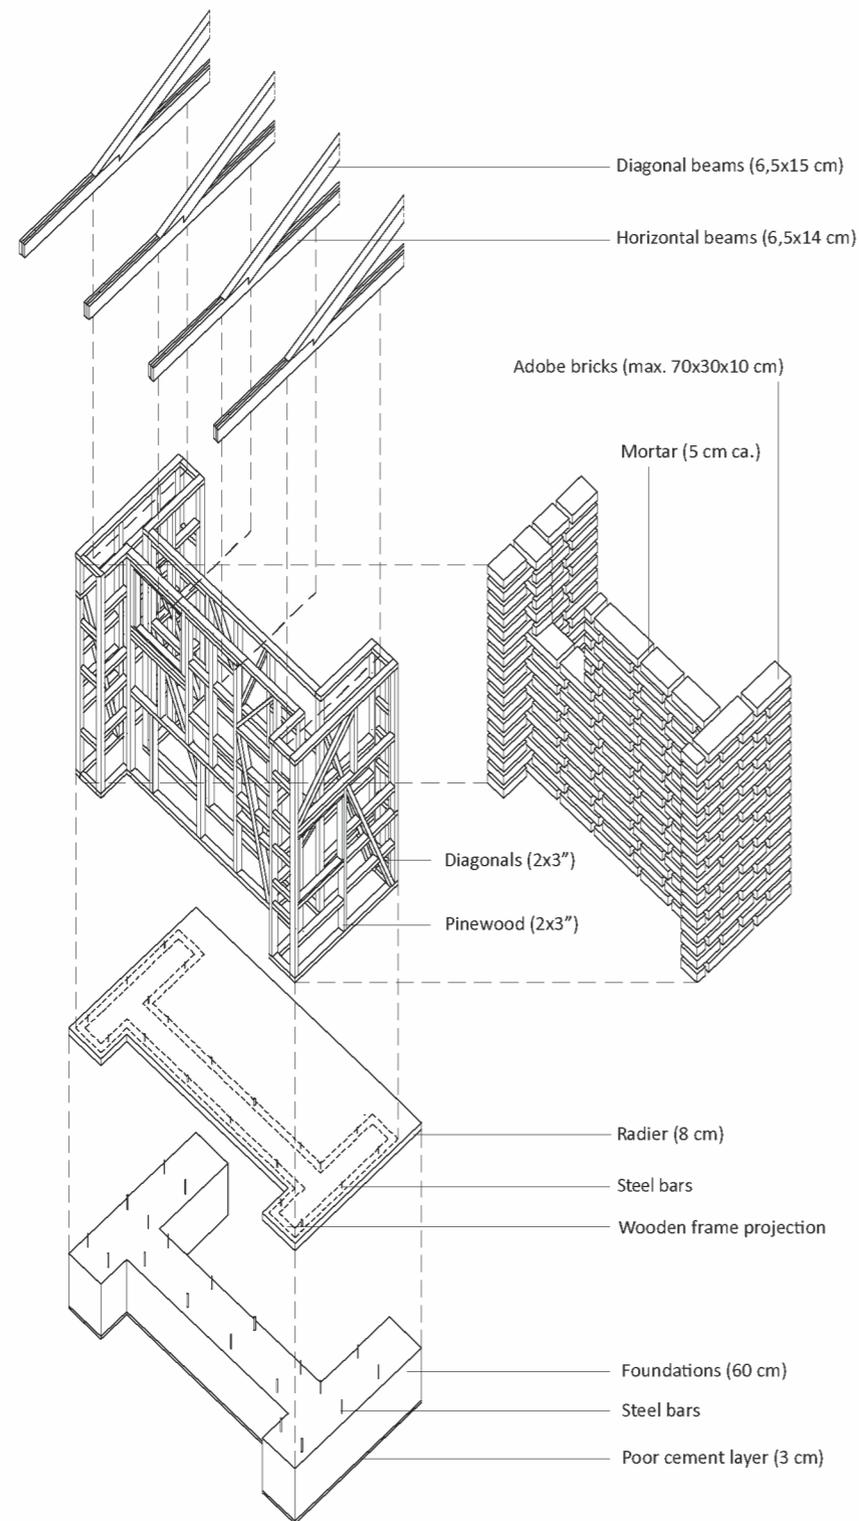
Axonometric showing how the adobe wall works. The wooden frame is an autonomous structure, linked directly to the foundations; the adobe bricks are secondary put inside it and also the horizontal beams of the roof are connected to the basket (drawing by the author)
